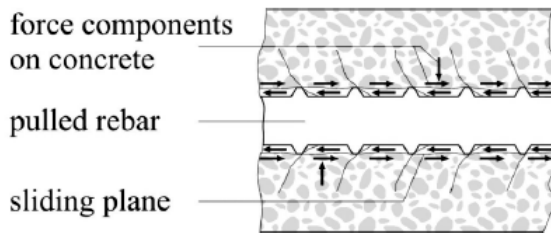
Formation of a sliding plane in pullout failure [55]
